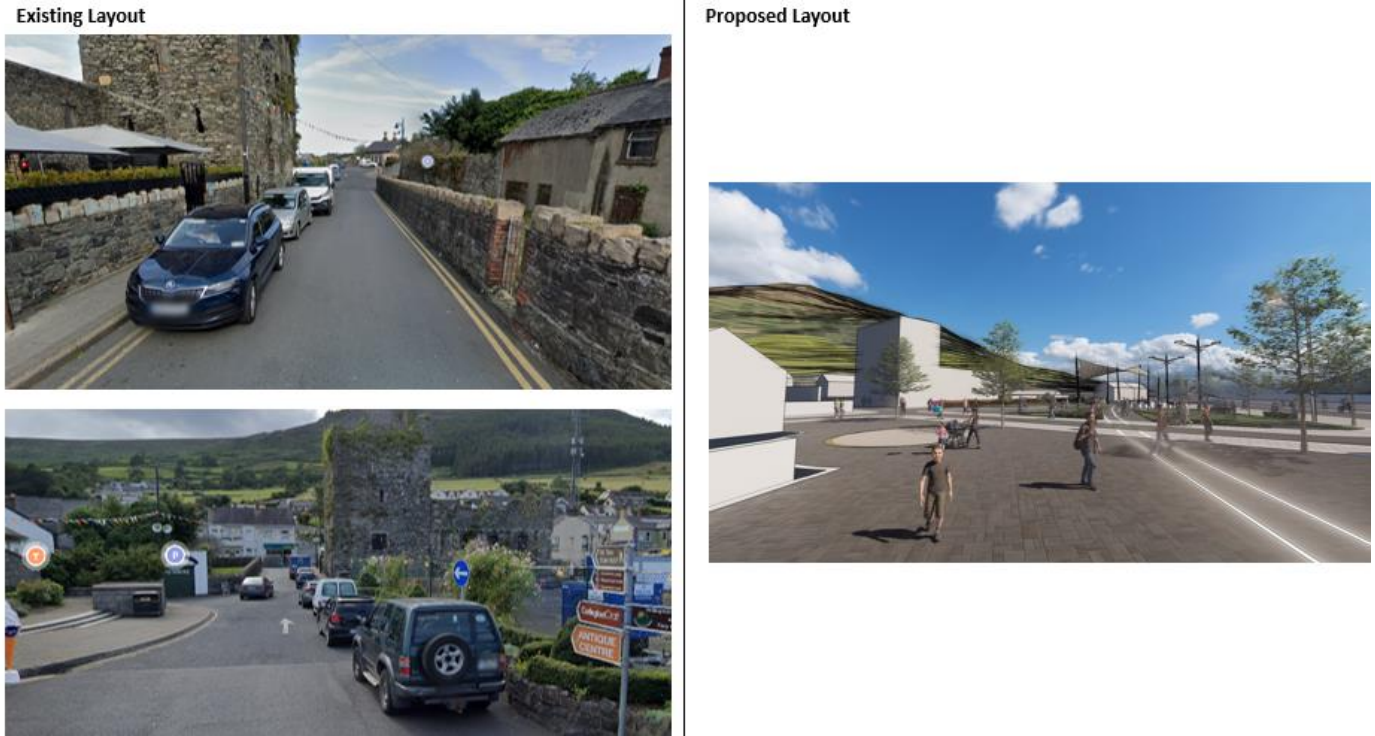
Link from R173 to Market St. Existing and Proposed Layout
